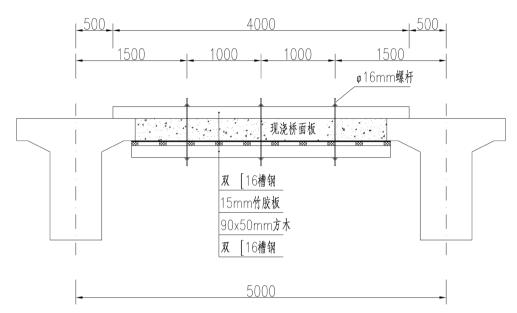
Construction diagram of bridge deck hanging formwork method 图 4. 桥面板吊模法施工示意图
